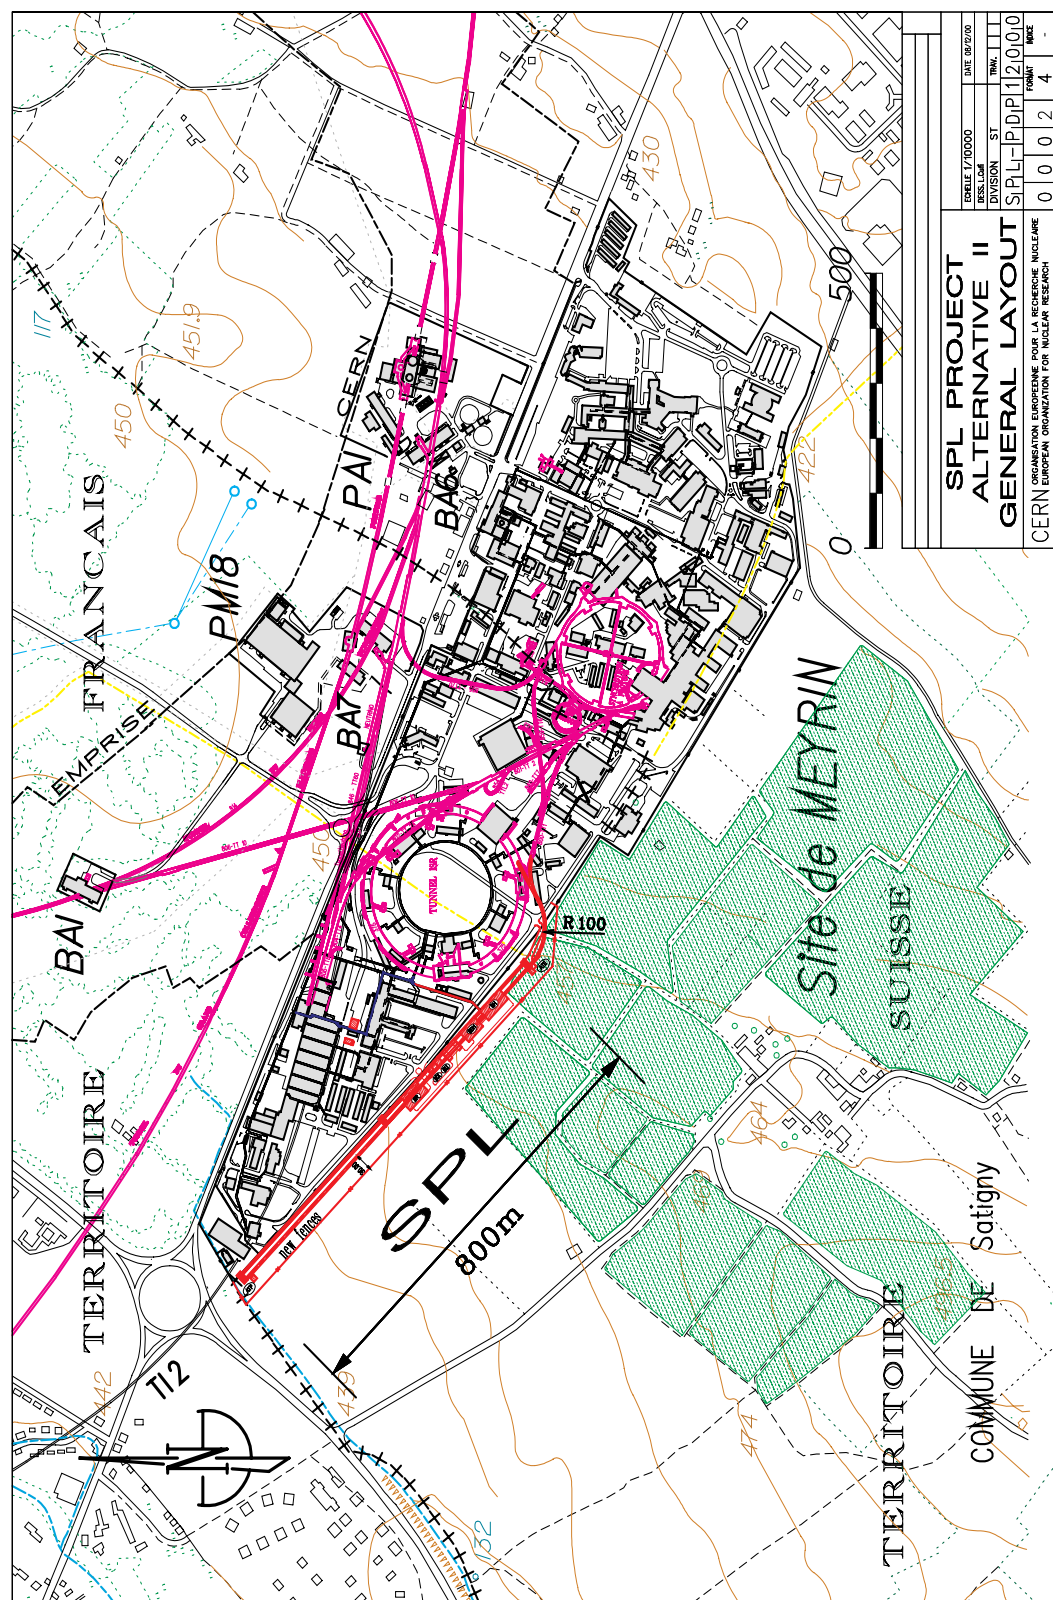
Proposed layout of the linac facilities on the CERN Meyrin site.
